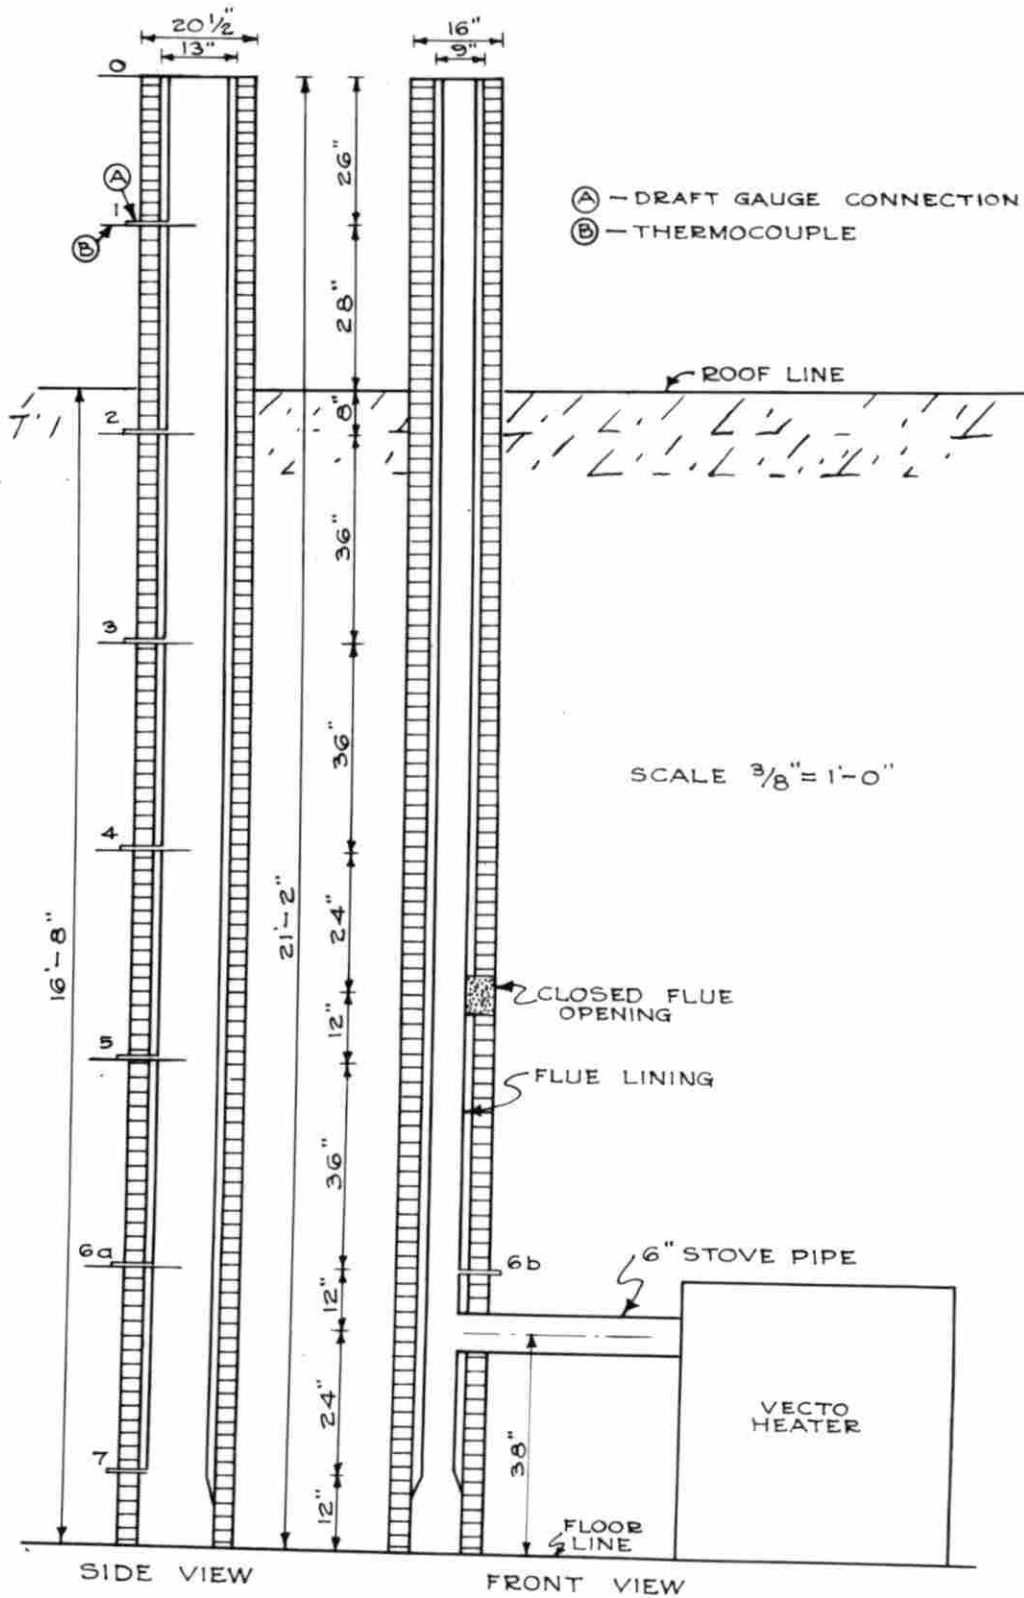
SECTIONAL SKETCH OF BRICK TEST CHIMNEY
